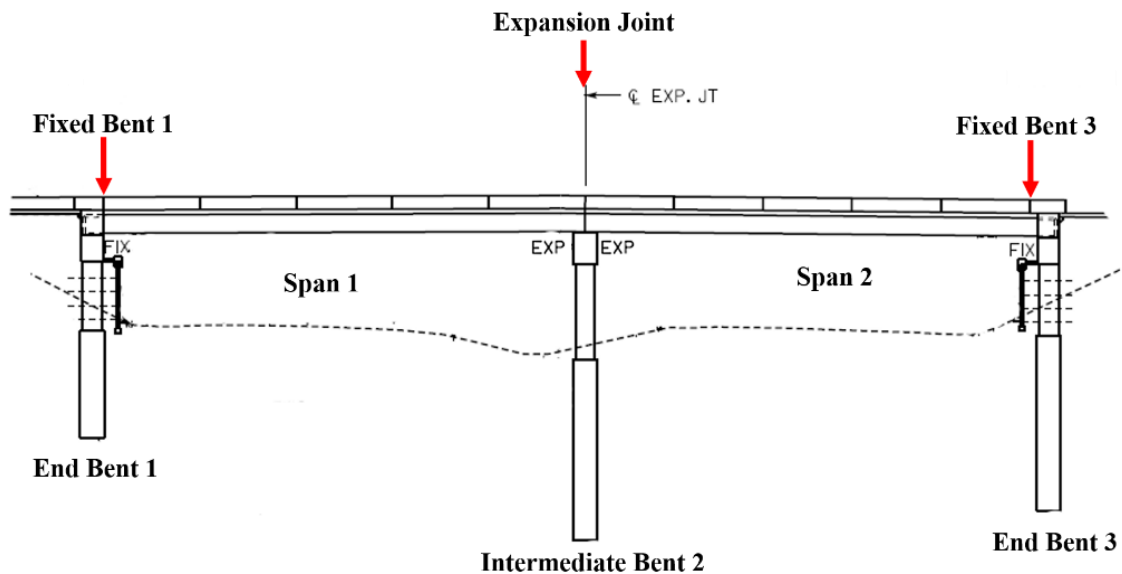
Elevation view of the SR299 bridge showing the fixity conditions.
